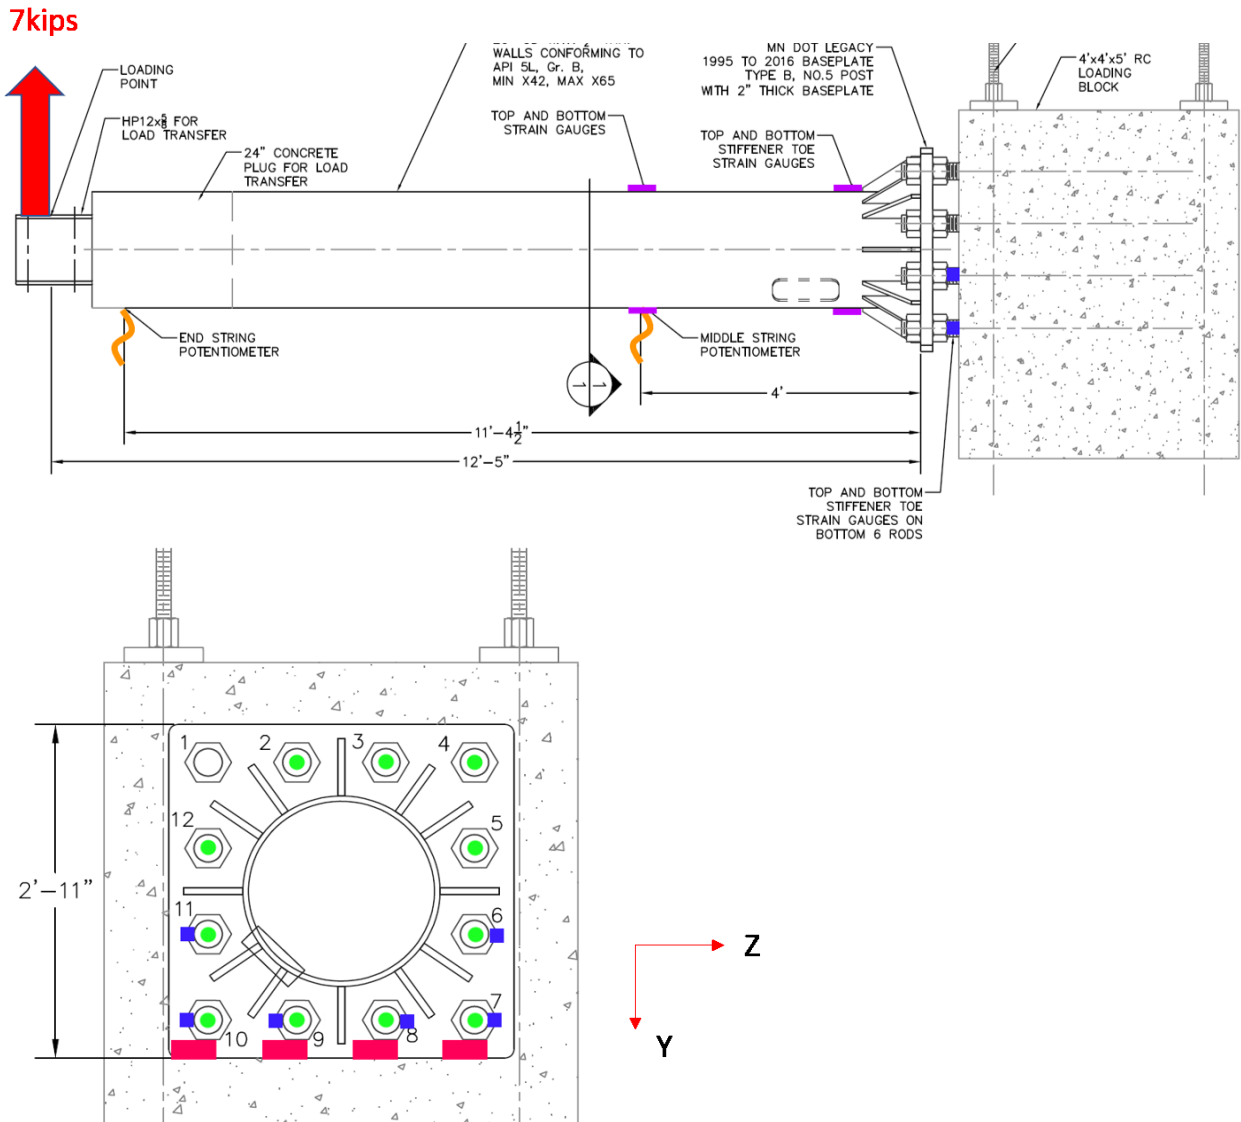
Static load protocol: elevation view (top) and front view (bottom)
